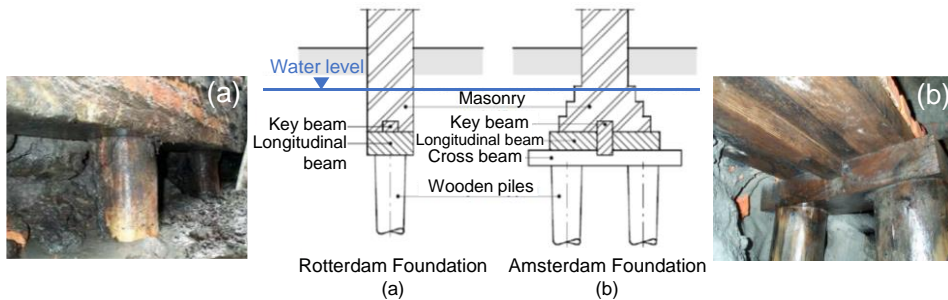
Wooden foundation types in Rotterdam (NL) and Amsterdam (NL): (a) Rotterdam foundation with a system of stand-alone wooden piles and only longitudinal beams; (b) Amsterdam foundation with cross beams and pair of piles (Adaptation from [17]).
